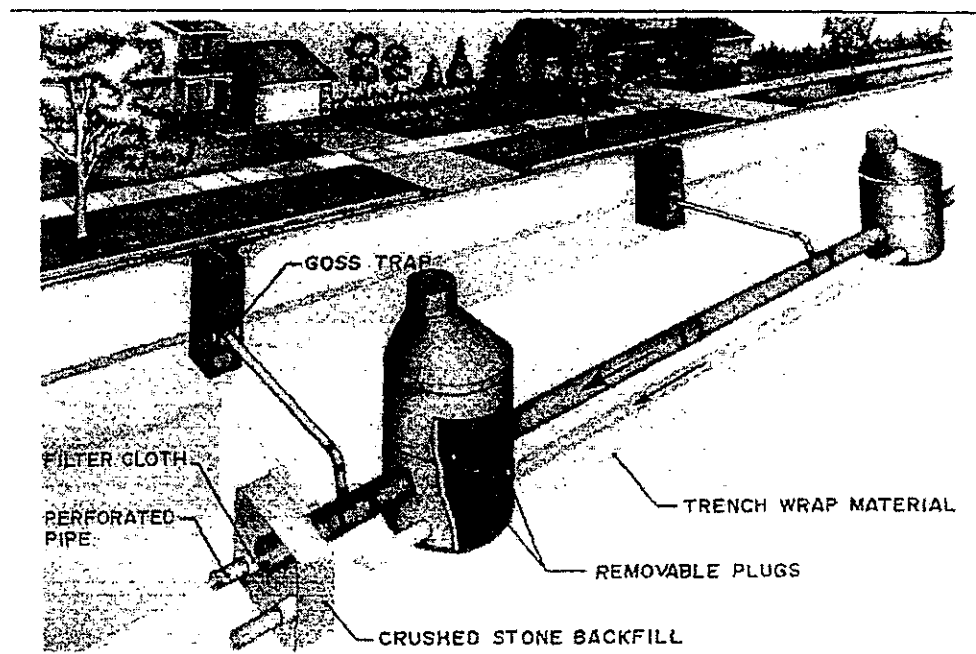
Typical Curb & Gutter Drainage System with Catchbasins and Exfiltration Trenches
